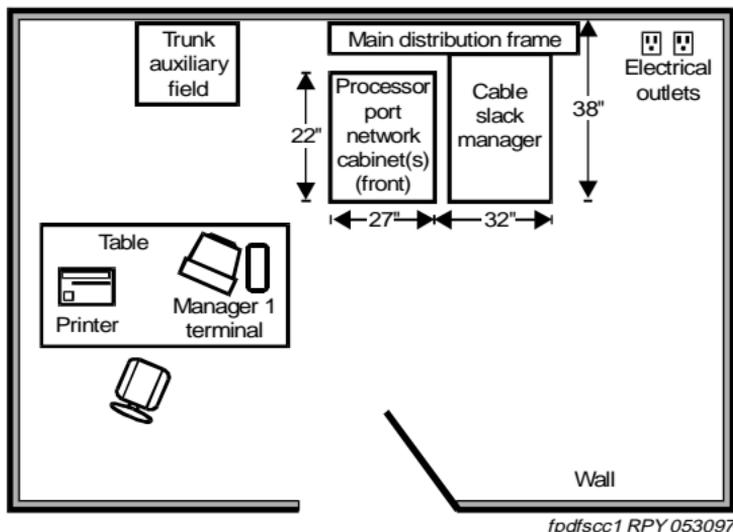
Typical Single-Carrier Cabinet Floor Plan
